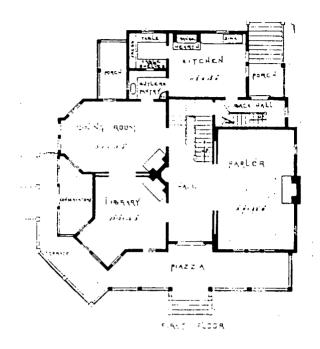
Palliser Co., Plate XIX, Plan, Frank Underwood House, Tolland, Conn. (Model Homes, 1878).
